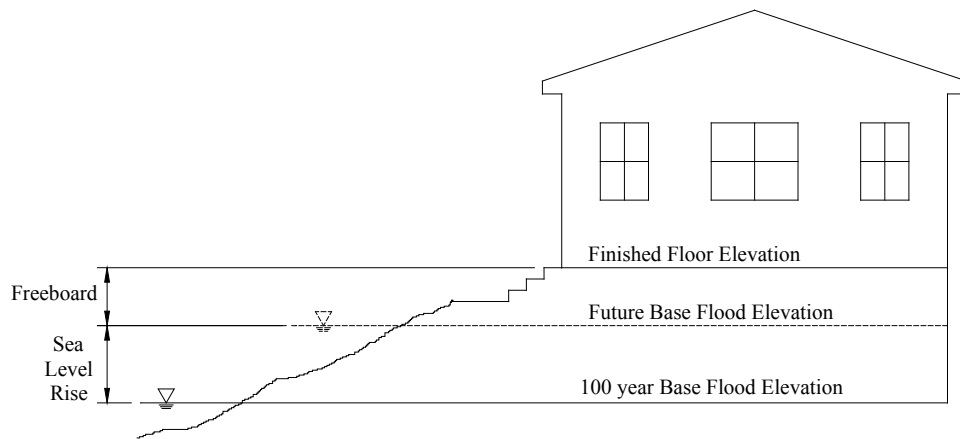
Coastal Area Finished Floor Elevation relative to the Base Flood Elevation. (Note: For Coastal High Hazard and Coastal Zone A above requirements apply to the Bottom of the Lowest Supporting Horizontal Structural Member of Lowest Floor.)
